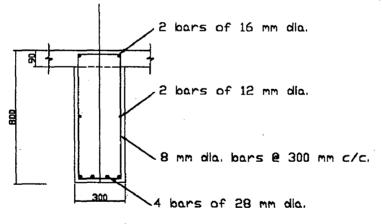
Sections for Rib no 1(Duter Edge beam)
